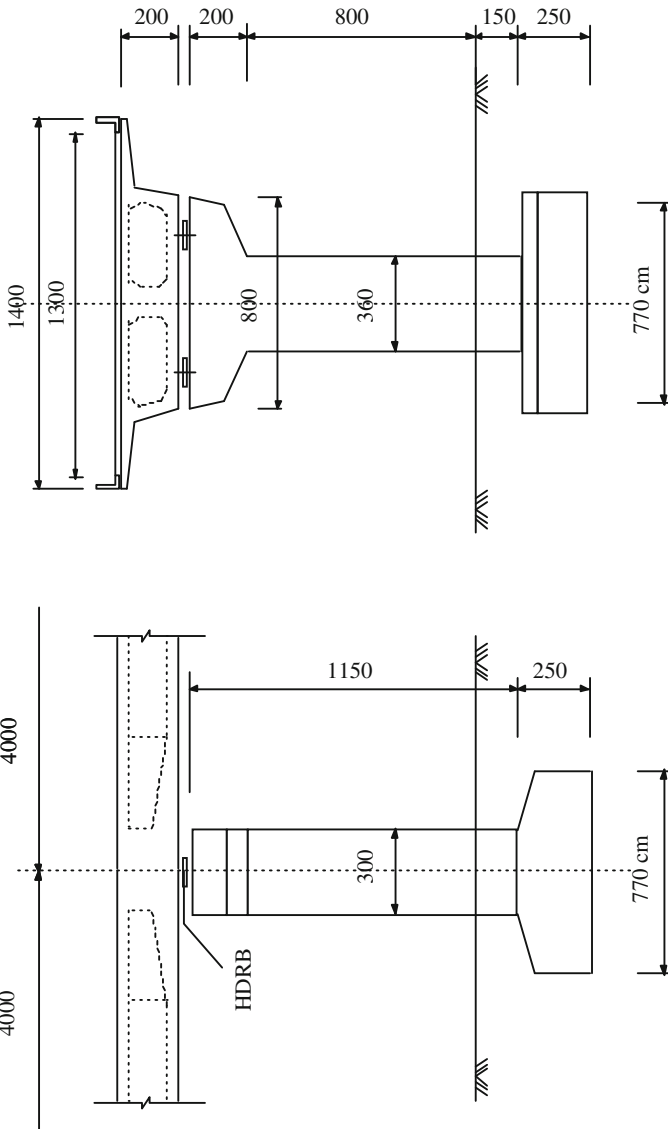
Longitudinal and transverse cross section of the bridge (Jankowski et al. 2000)
